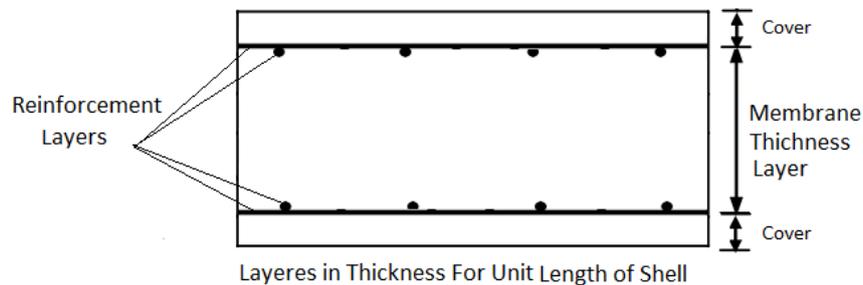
Layered shell element to model the different layers of concrete and reinforcement
